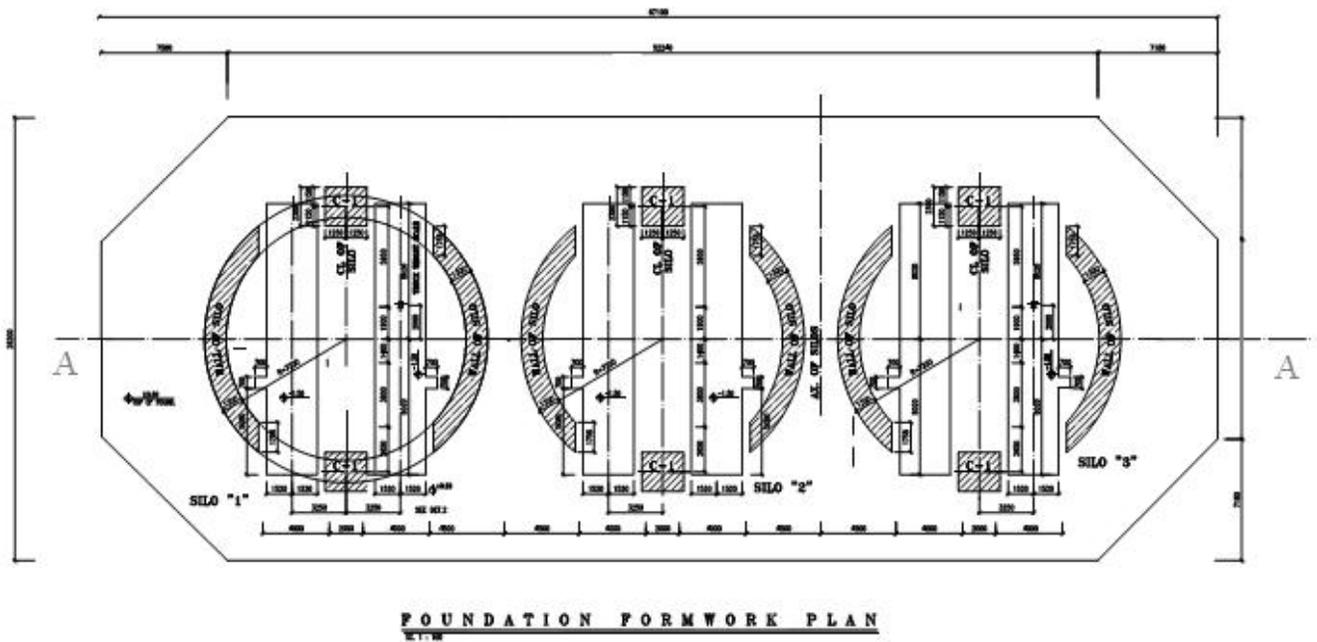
A Plan view of Delijan's Silo Structure and its Foundation
